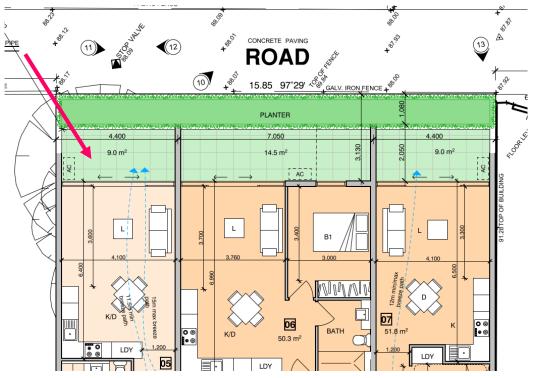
Example of the balcony sizes to apartments 5, 6 and 7 on the first floor facing north.
